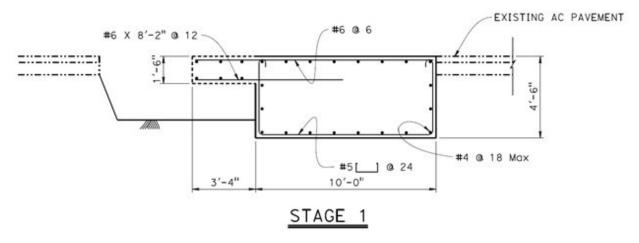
Stage 1 Construction of Anchor Block and Bridge Deck Overhang
